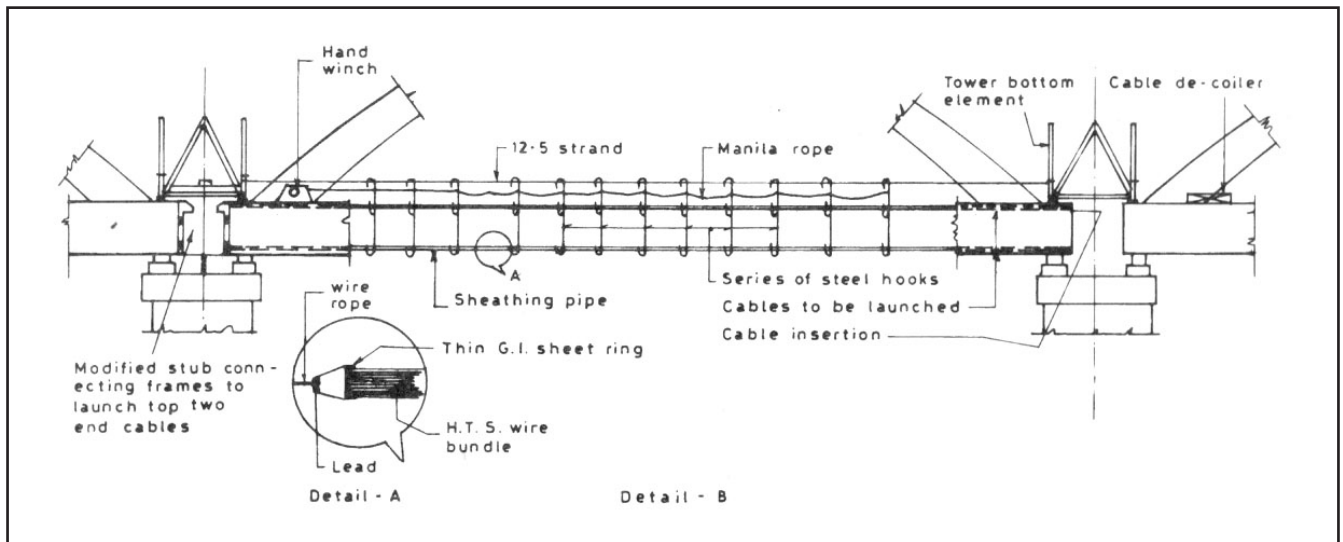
Catenary wire system for launching of tie girder cable and improved connecting frame
